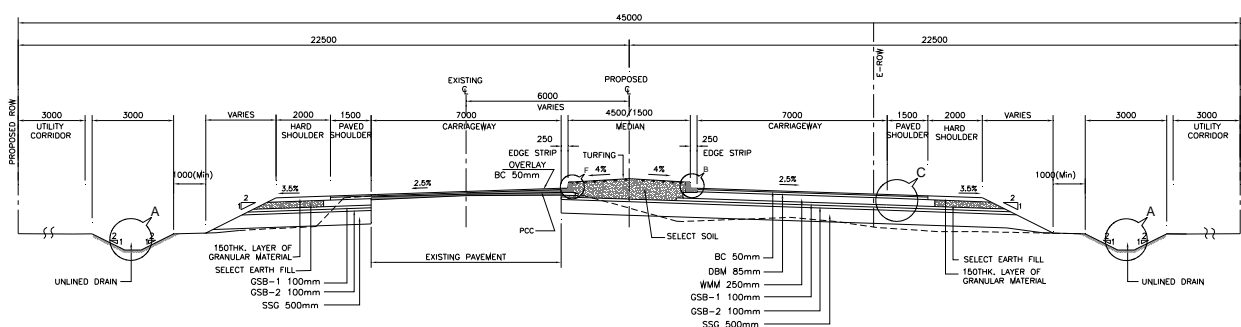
TYPICAL CROSS SECTION FOR RIGHT HAND SIDE WIDENING IN RURAL AREA
